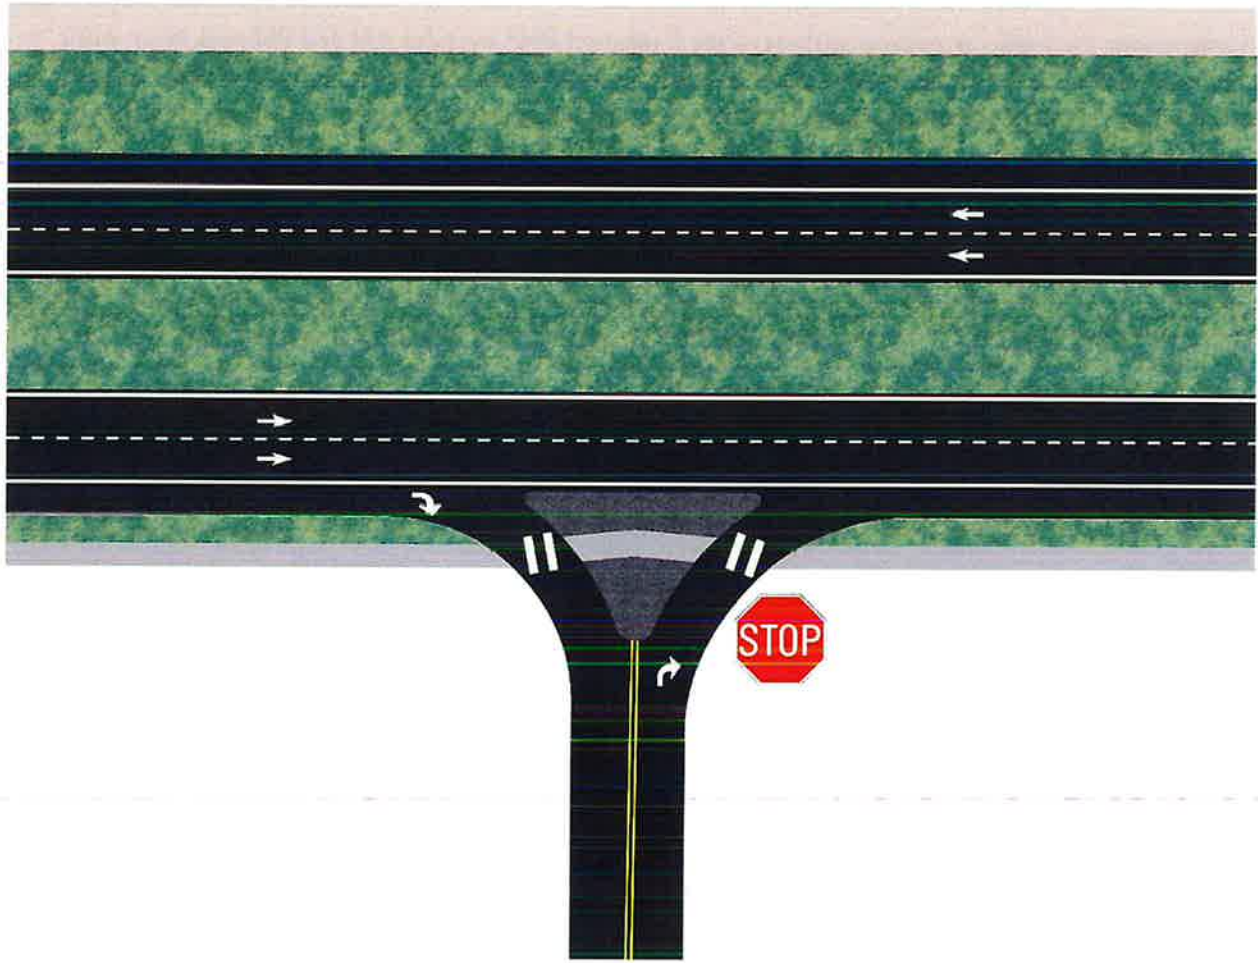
Typical Right-In/Right-Out Only Intersection Layout
